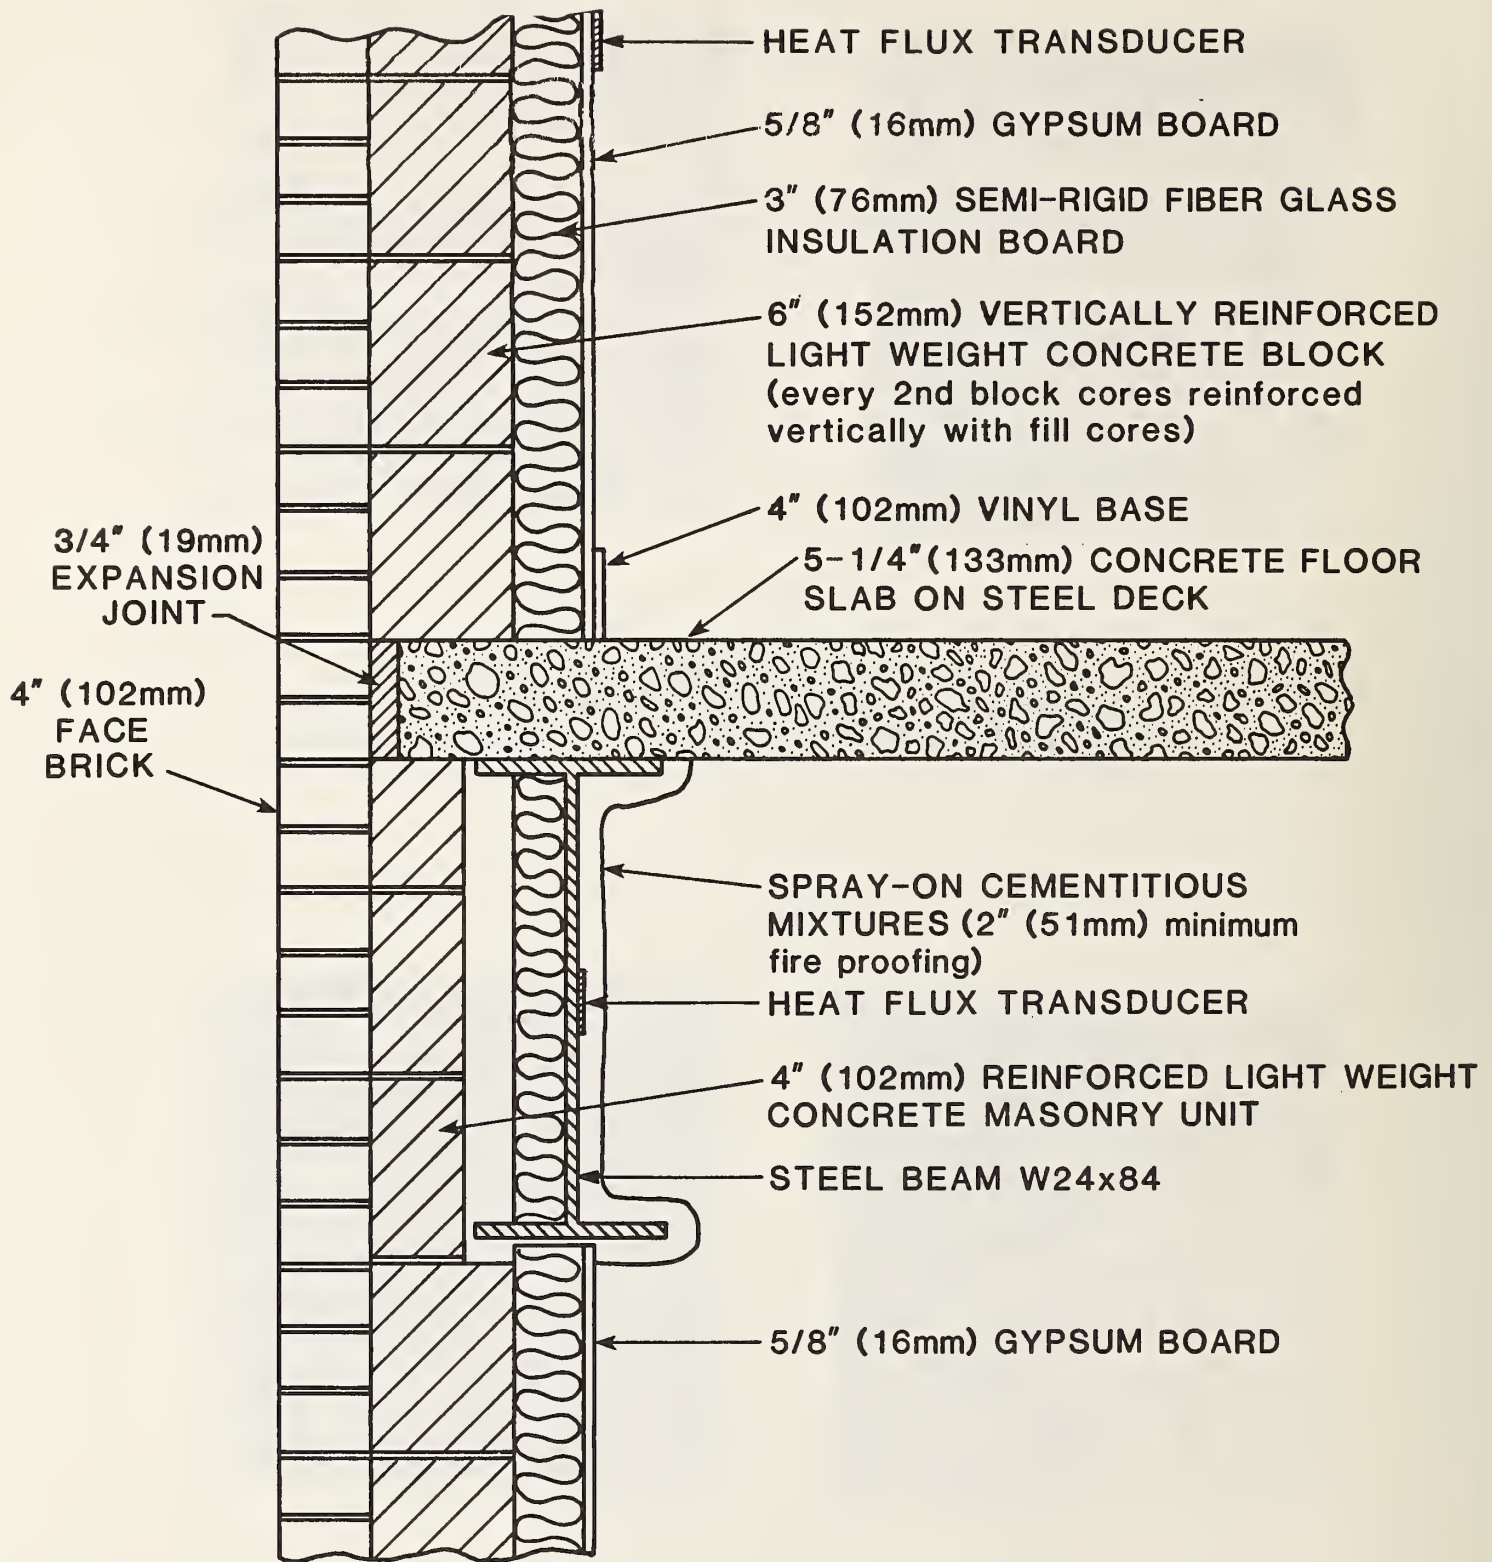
Construction Details and Sensor Locations on the Exterior Wall in the Huron Office Building
